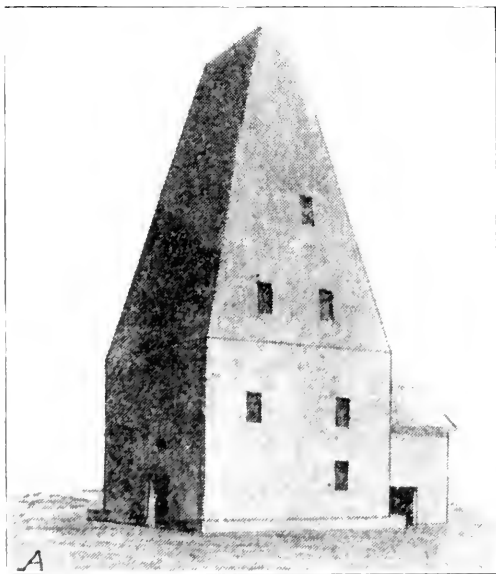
Perspective drawing made from the client's preliminary sketches for shaft houses to inclose old wooden structures.
